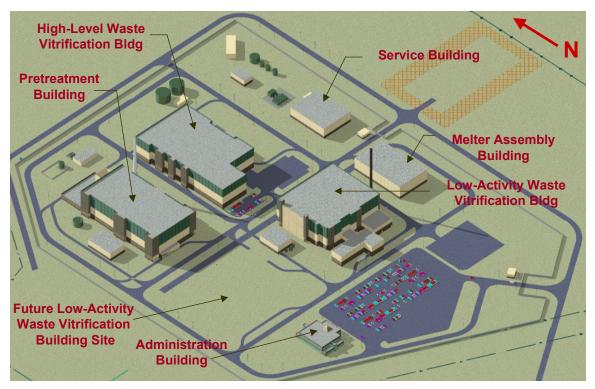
Site Model of River Protection Project – Waste Treatment Plant.
